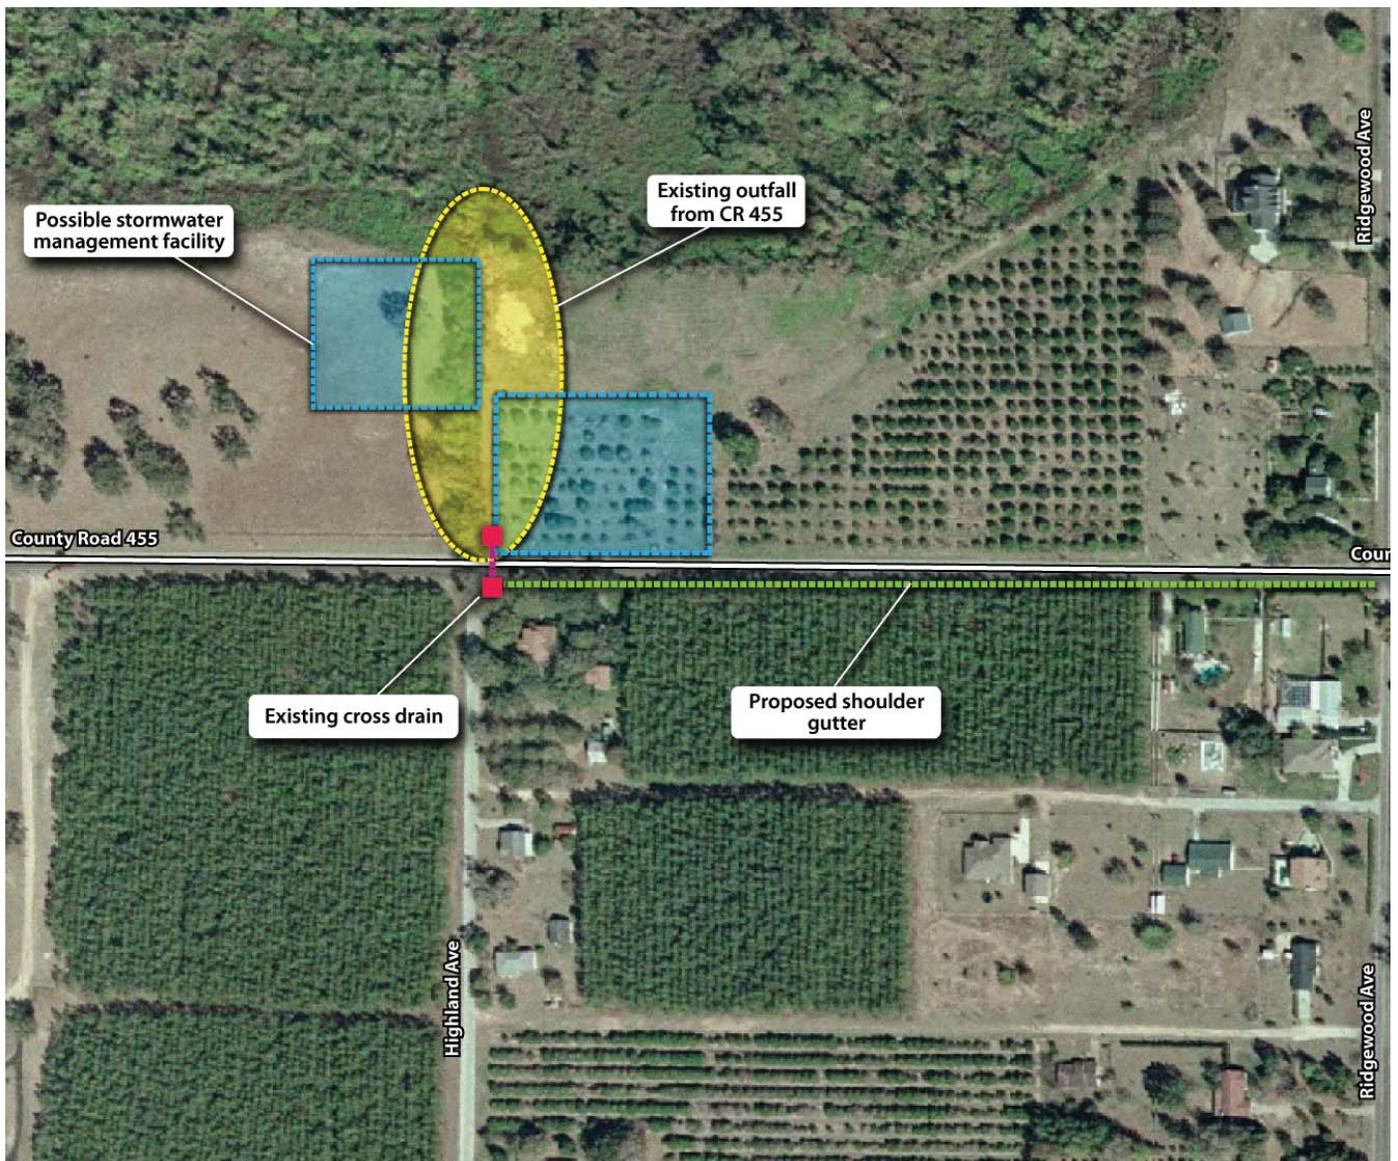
CR 455/Porter Avenue to Ridgewood Avenue Drainage Recommendations
